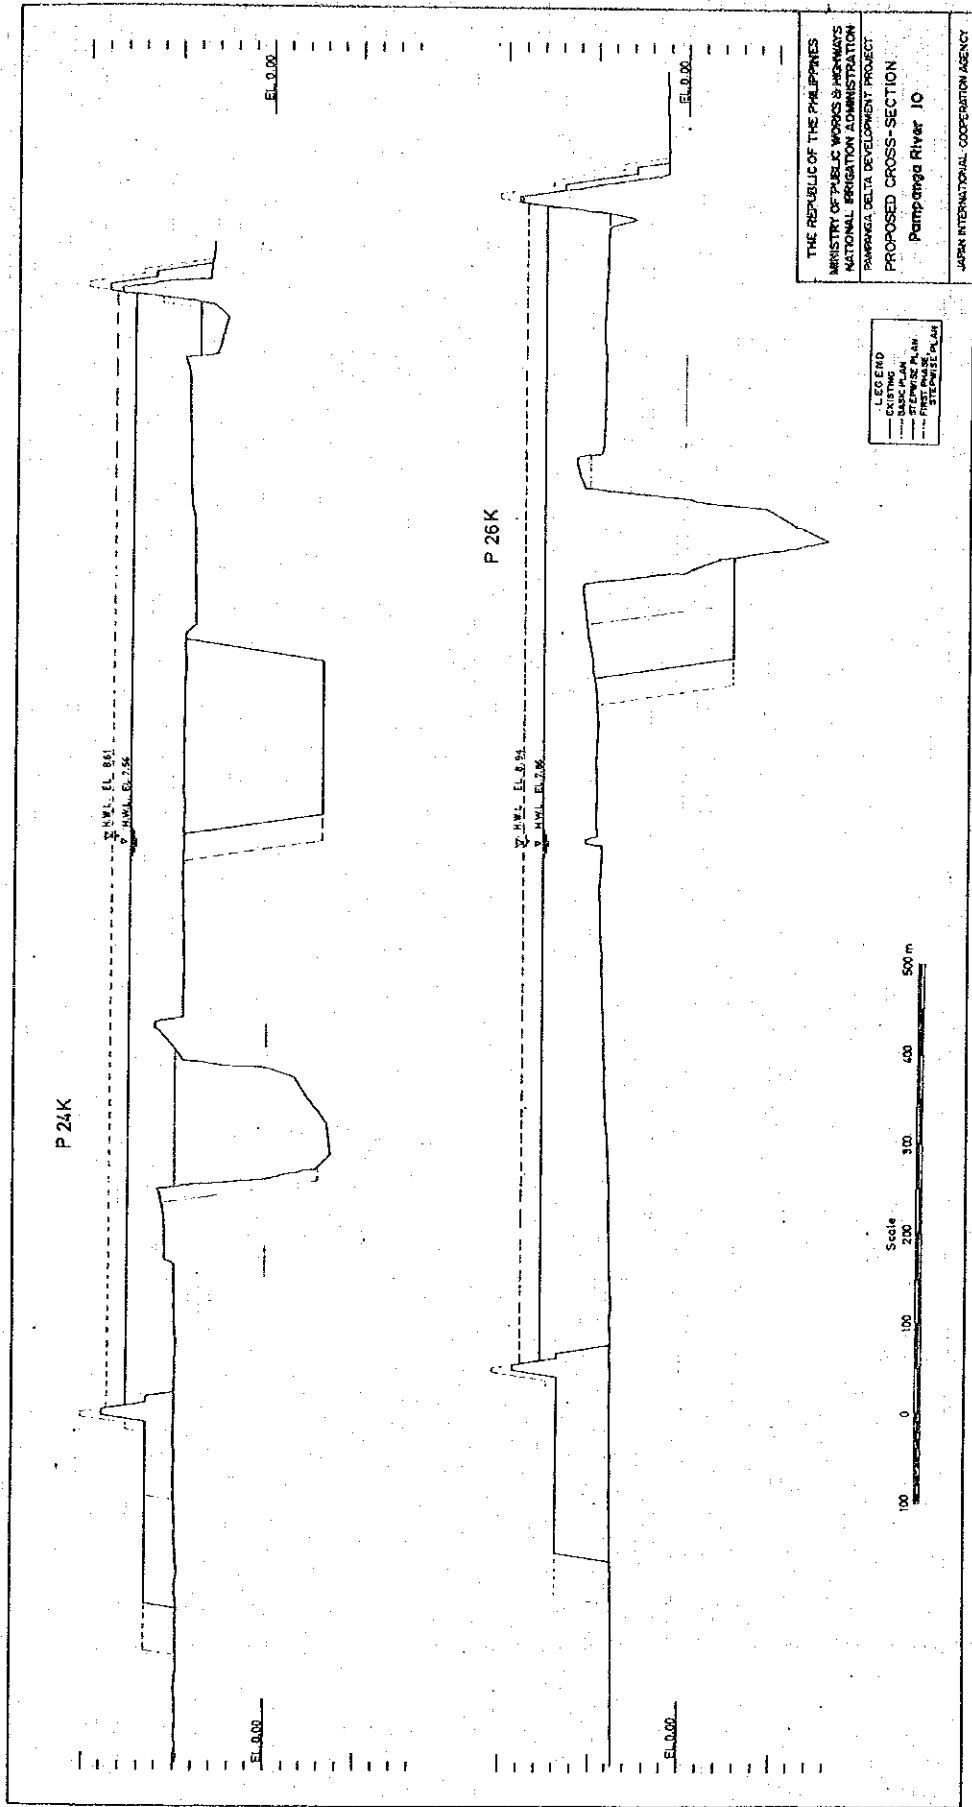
(11) PROPOSED CHANNEL CROSS-SECTION
